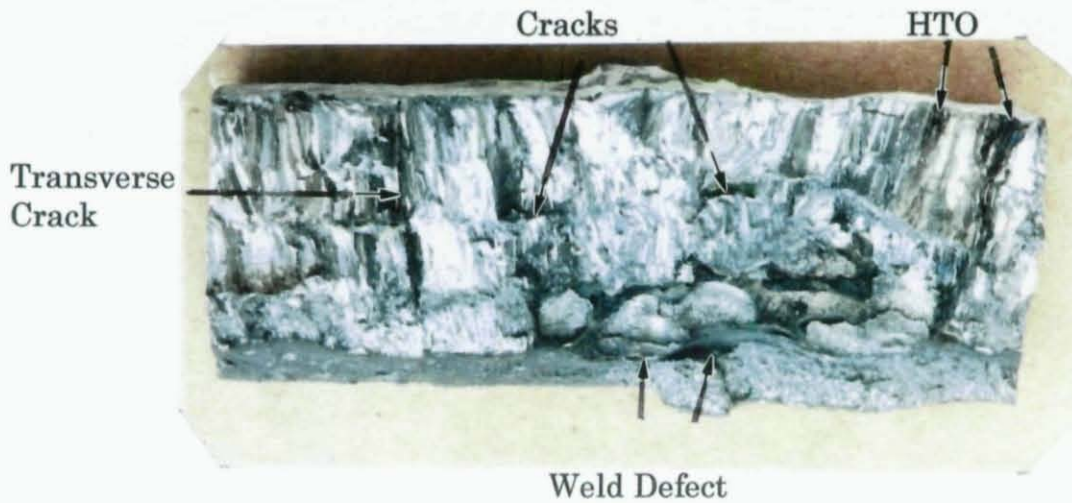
Fracture surface of the center section from the west-beam bottom- flange joint.
